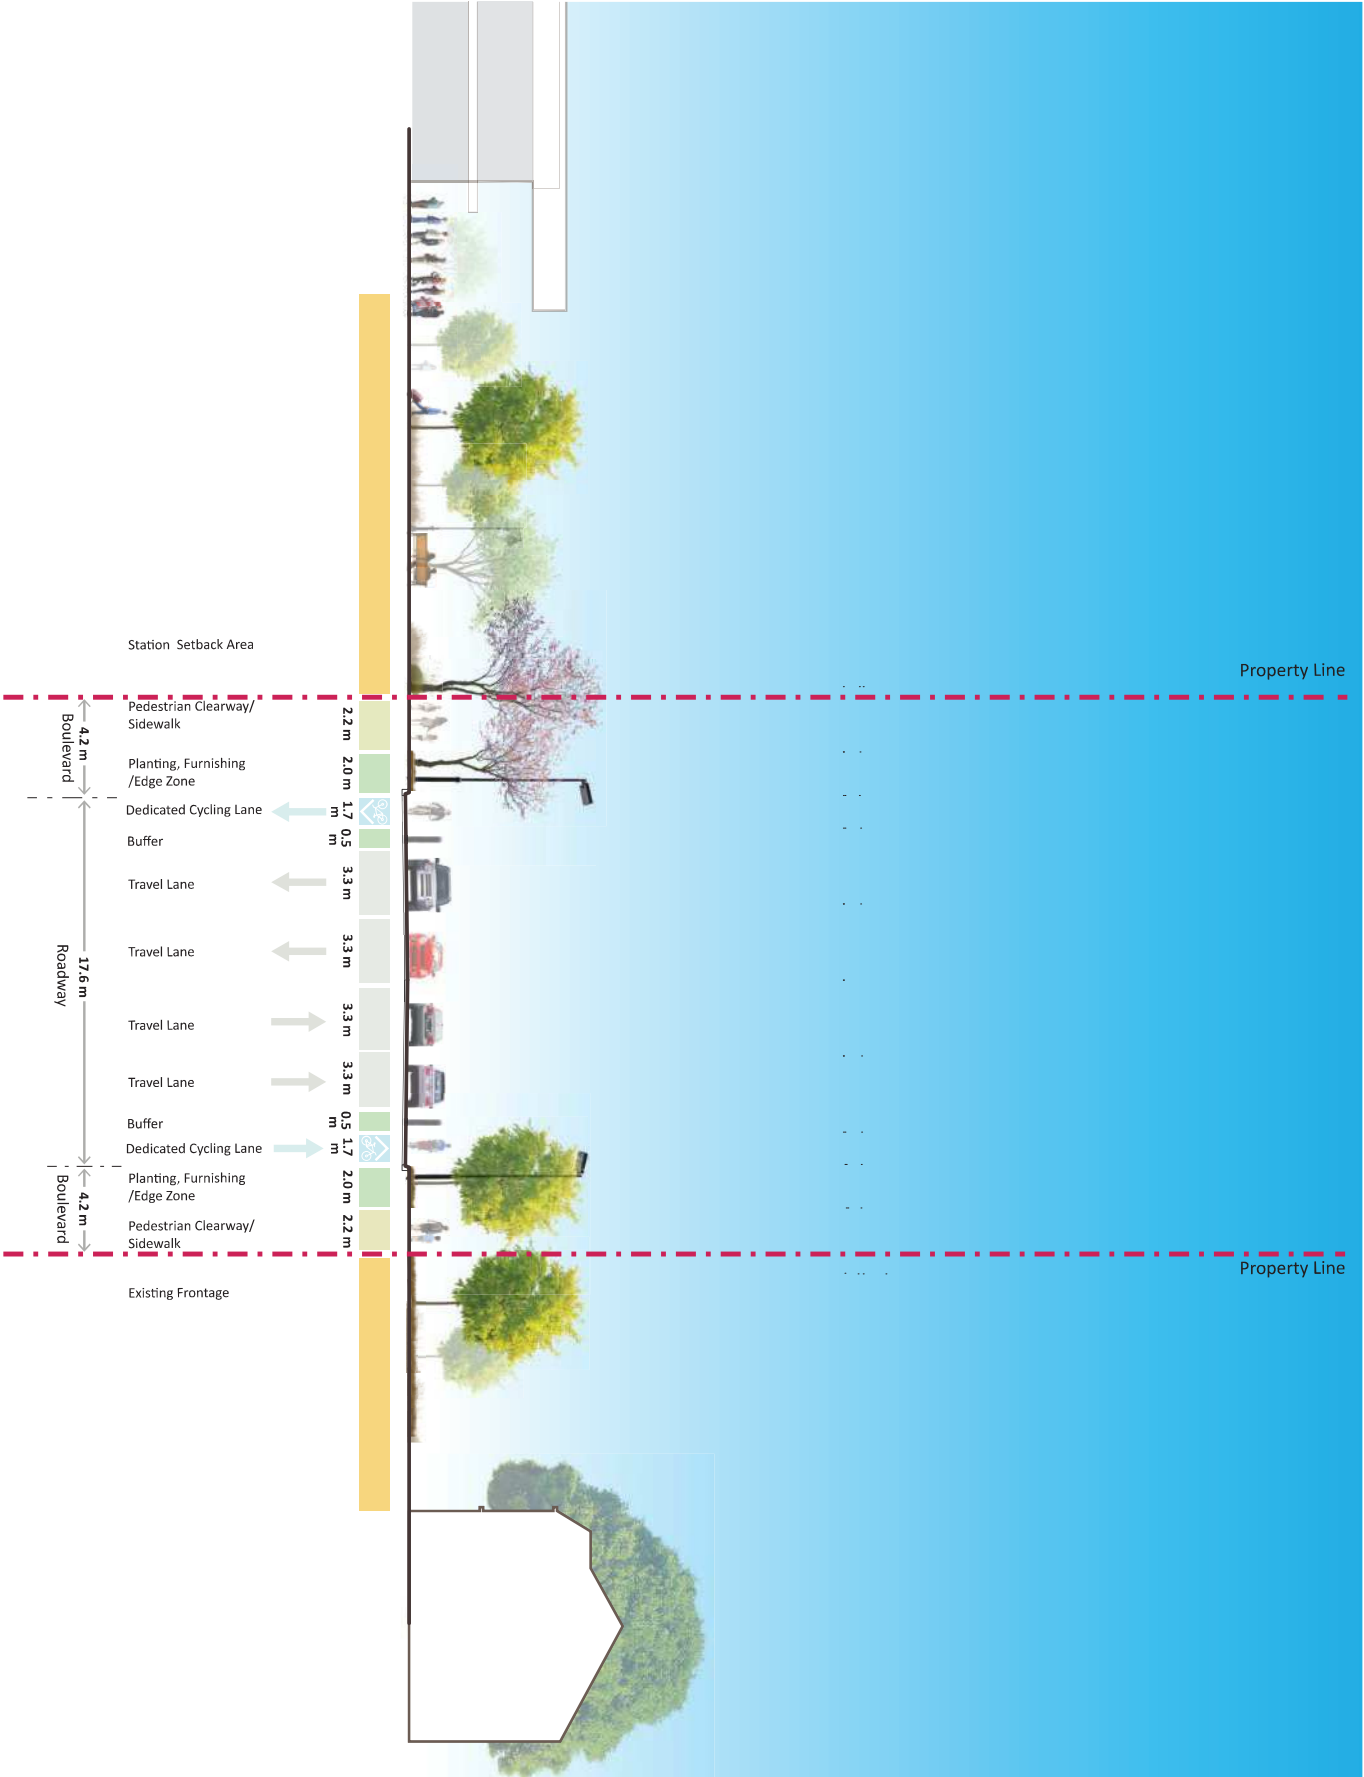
Cross Section - Casablanca Boulevard (Bridge over QEW - Subject to the Casablanca
